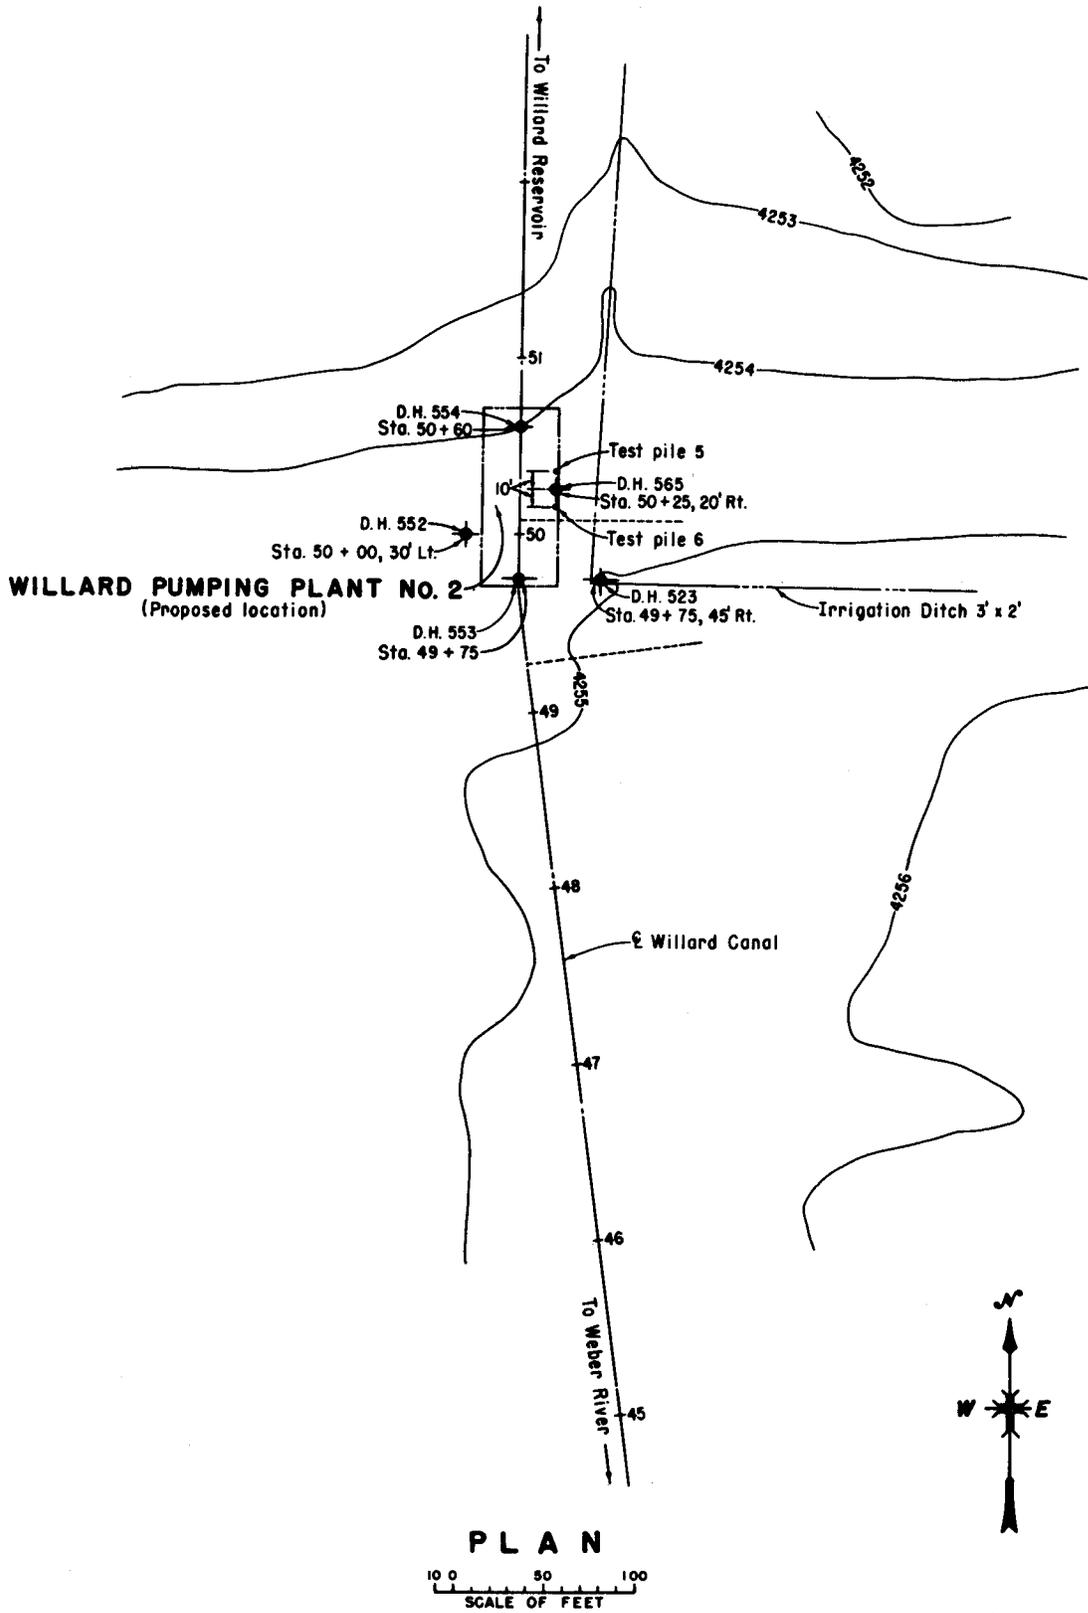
Foundation exploration and pile testing plan for Plant No. 2.
